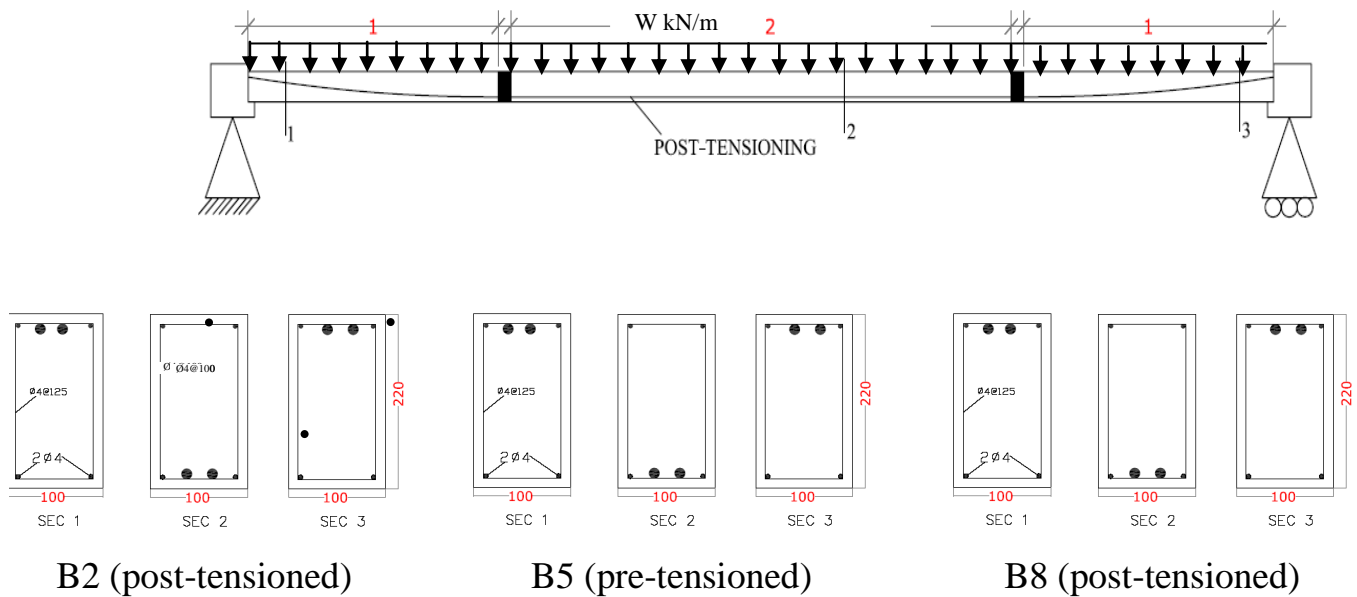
Dimensions and reinforcement details of Girders (B2, B5, and B8).
